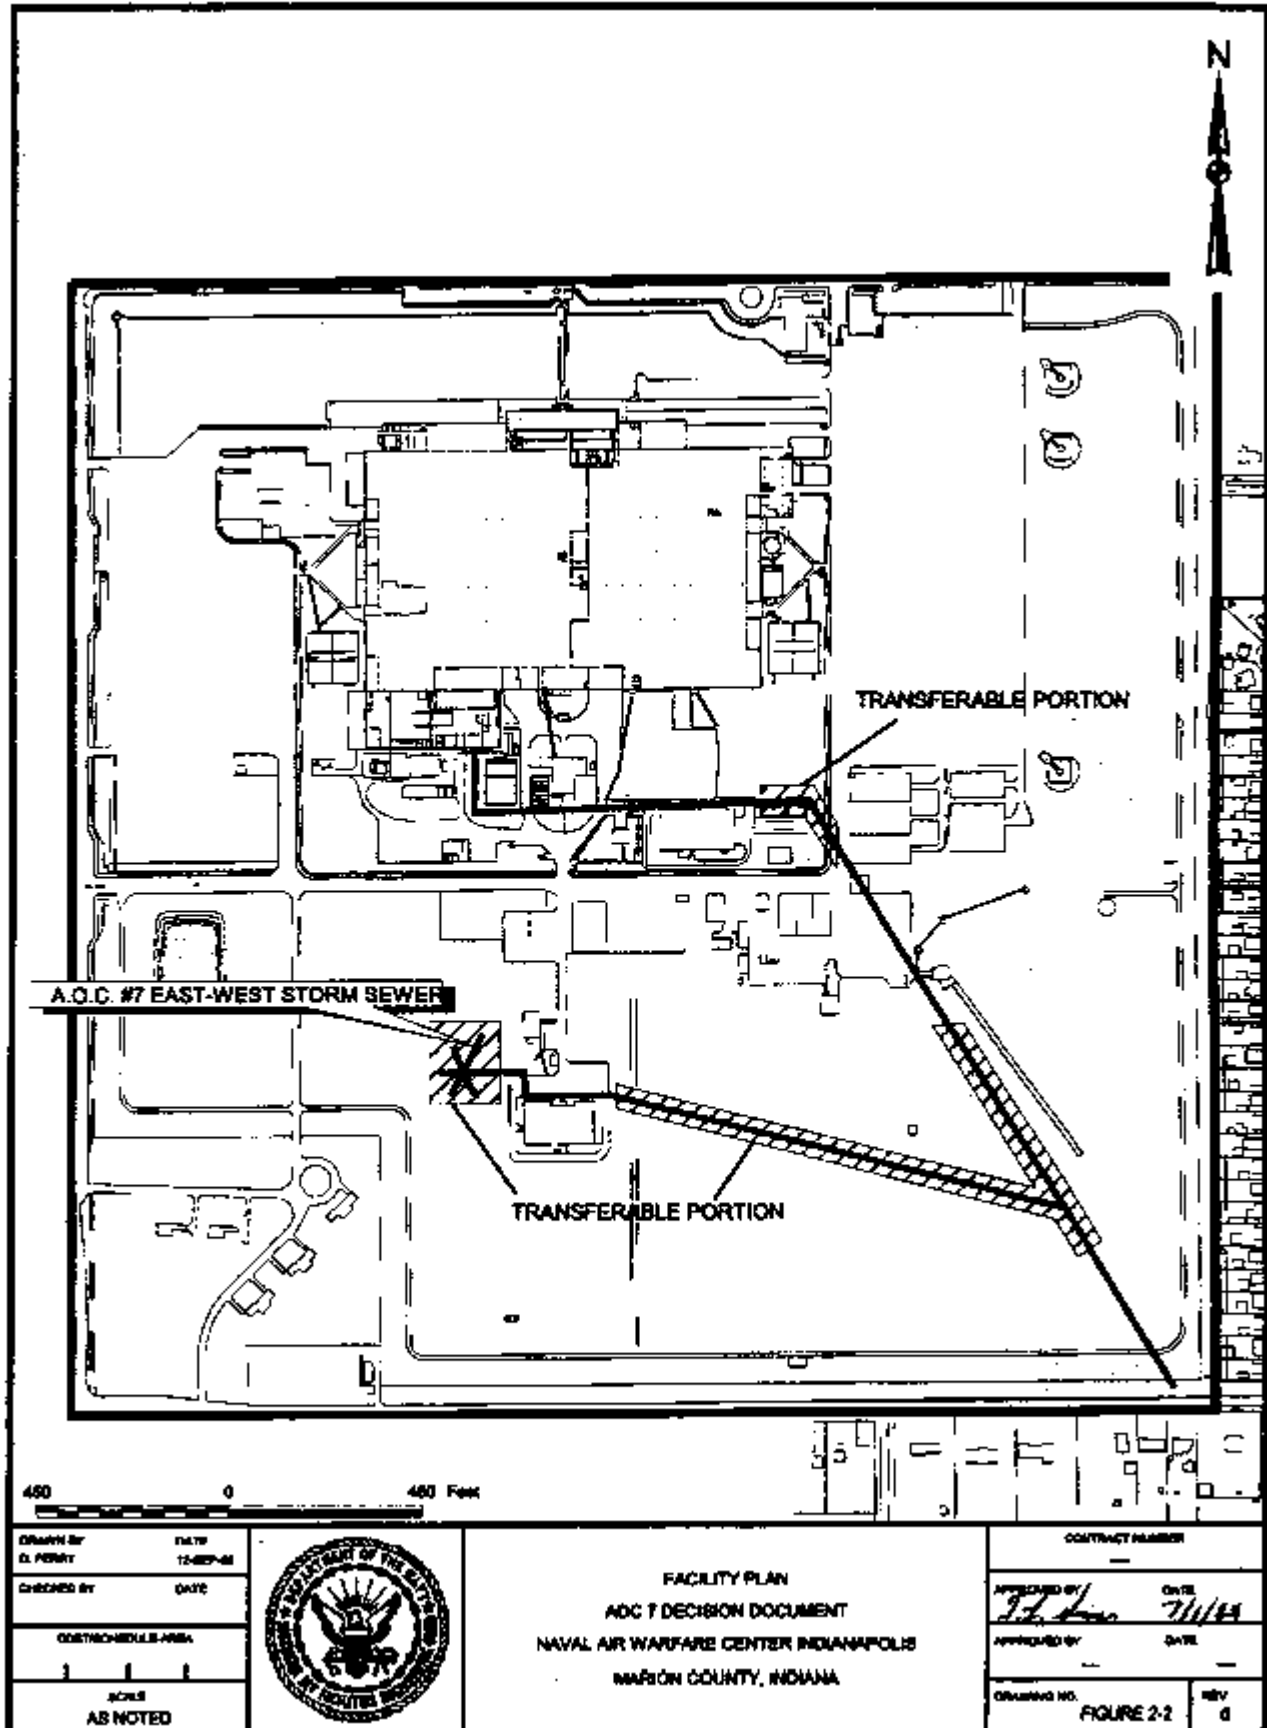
PROPOSED PLAN ARE 12-SEP-98 and AOC 7 LAYOUT
